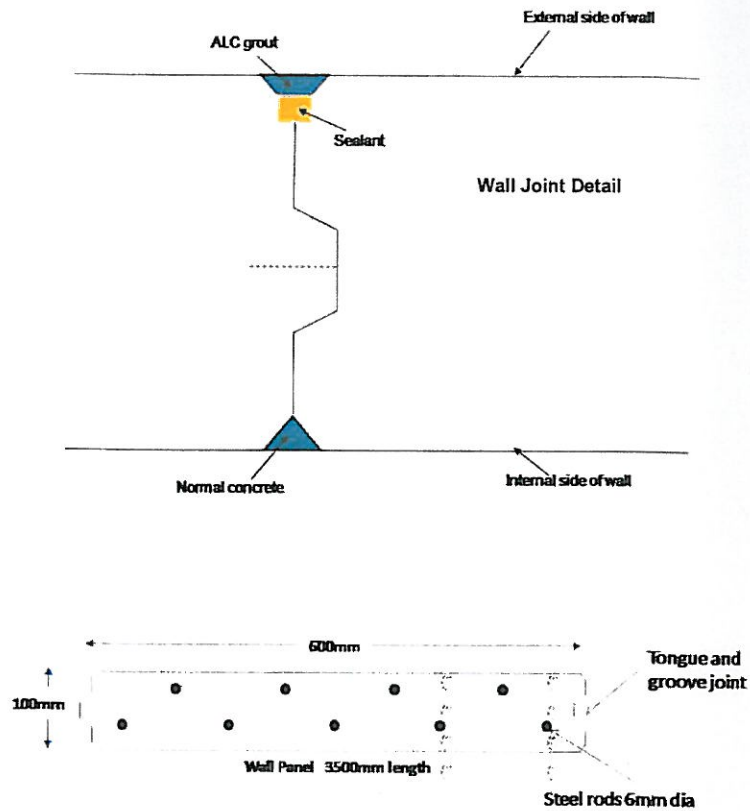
Joint Detail and Cross Section of ALC wall panel
